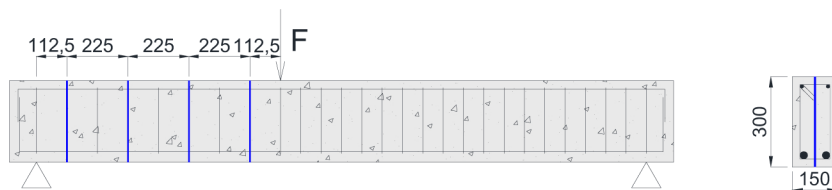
Reinforced concrete ETS strengthening beam: geometry, support, steel reinforcement scheme and loading conditions [dimensions in mm] (Dalfré et al. 2011).
